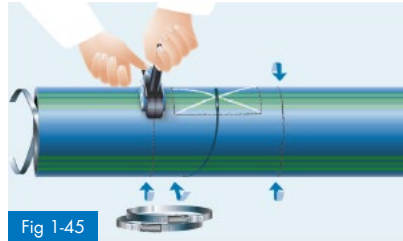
Removal of the protective layer with the egeplast M10 / M10 maxi peeling tool
